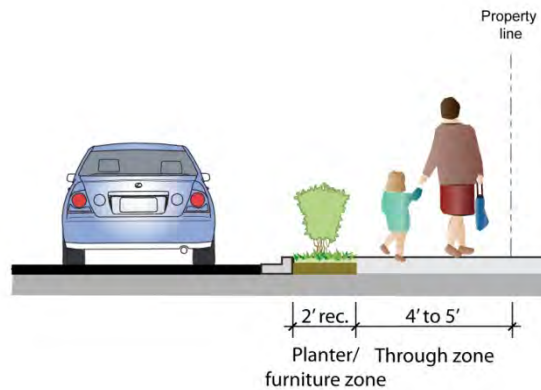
Typical Sidewalk Zones in Residential Areas
